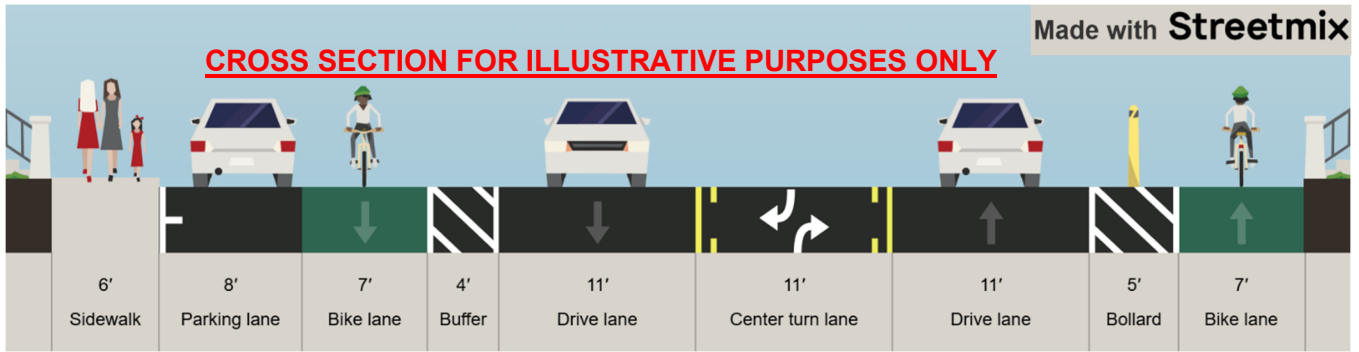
Potential road diet cross section for Moraga Road between Corliss Dr and Donald Dr, incorporating 3-lane cross section with two-way left turn lane, wider bike lanes and buffers. Created using Streetmix (<https://streetmix.net>).
